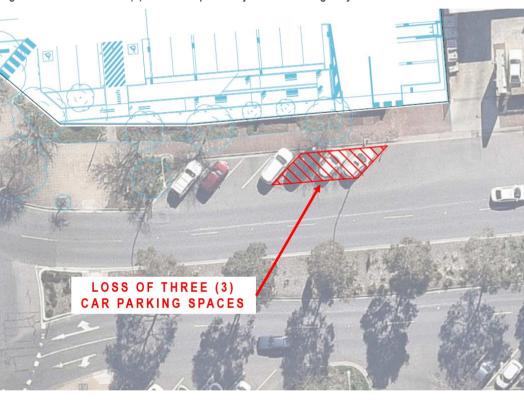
Loss of three (3) on-street spaces adjacent Anzac Highway Access
